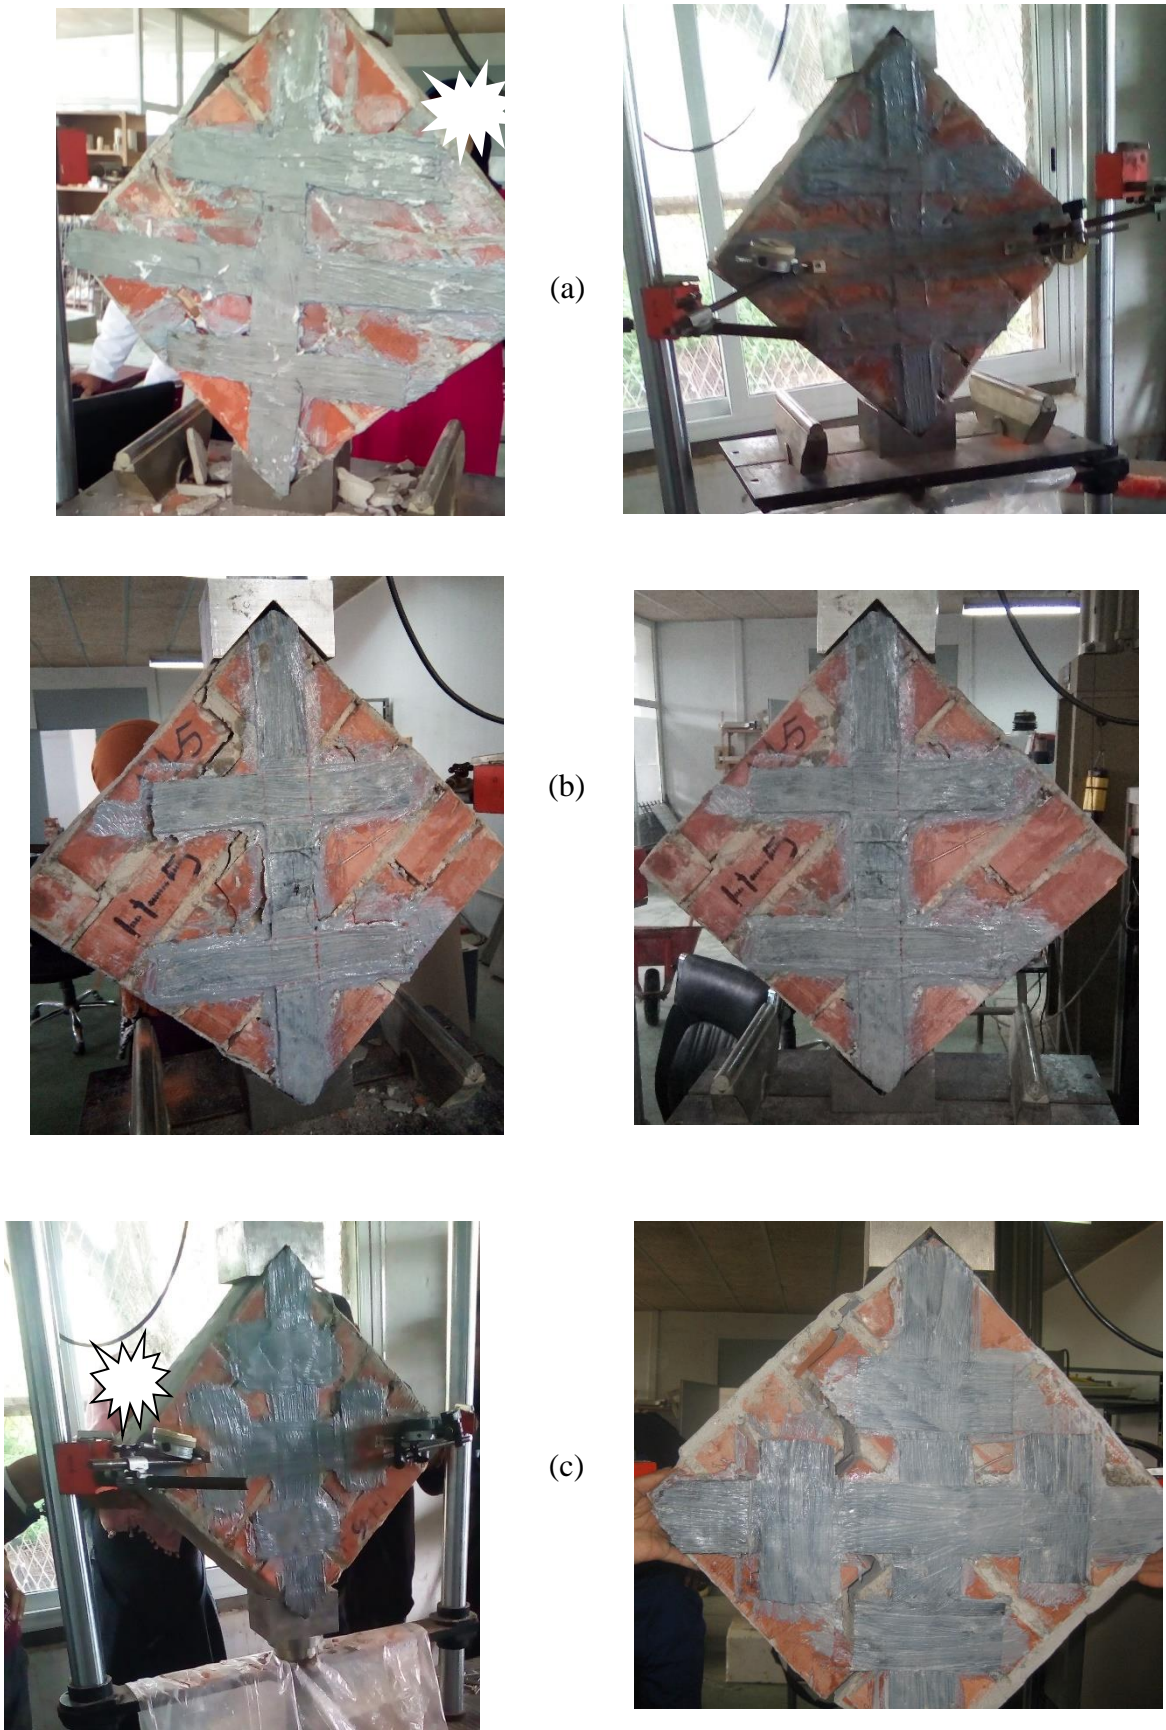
Failure modes of all strengthened masonry panels :(a) MHA and MHB, :(b) MIA and MIB, :(c) MXA and MXB
